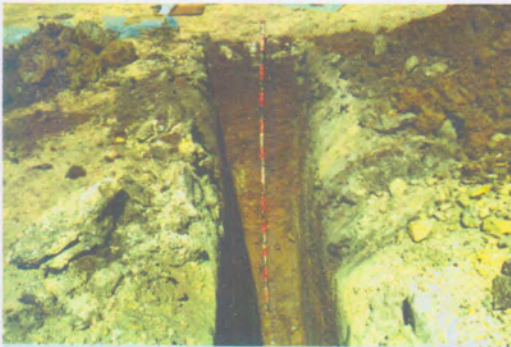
Study site B. One of the test pits, maximum depth 2.40 m.
